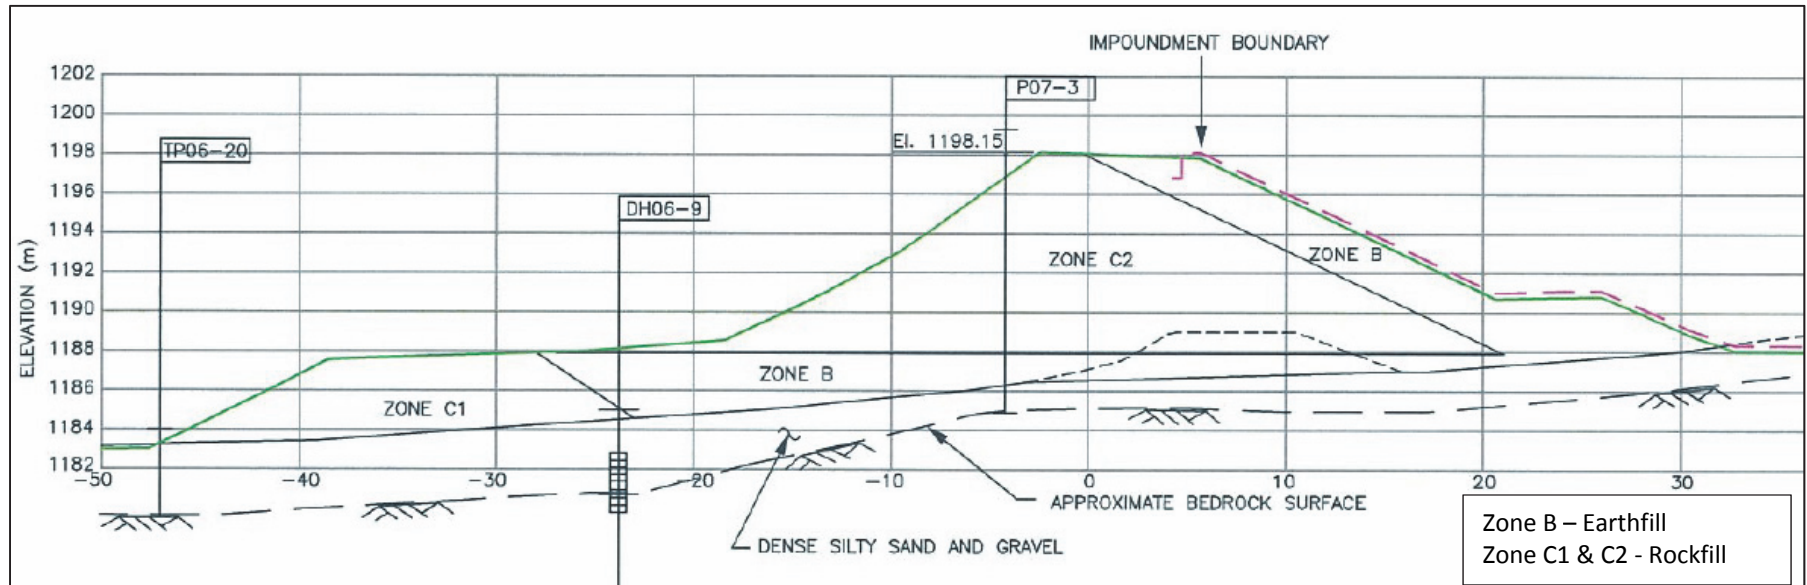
Typical Starter Dam Embankment Cross Section (Sta. 3+50)
